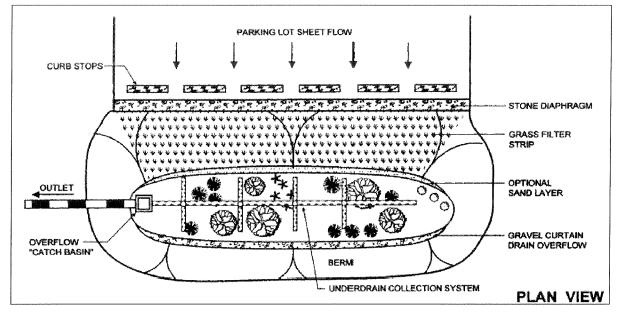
Landscape Detention Facility for Parking Lot Runoff
